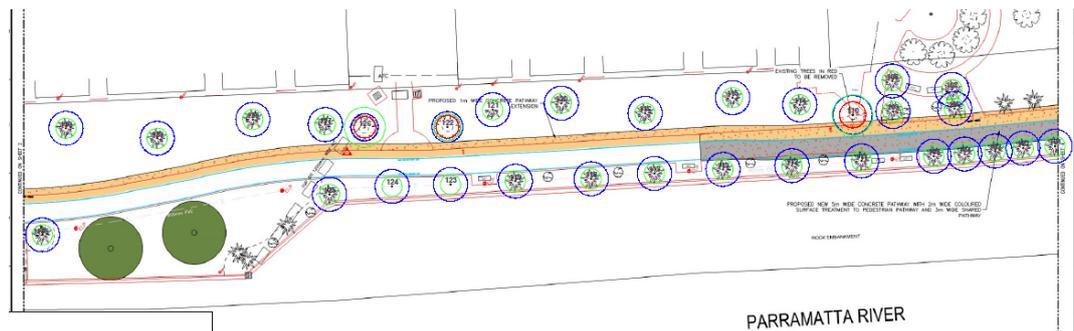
Site Plan (Sheet 3). Source: Hugh The Arborist
